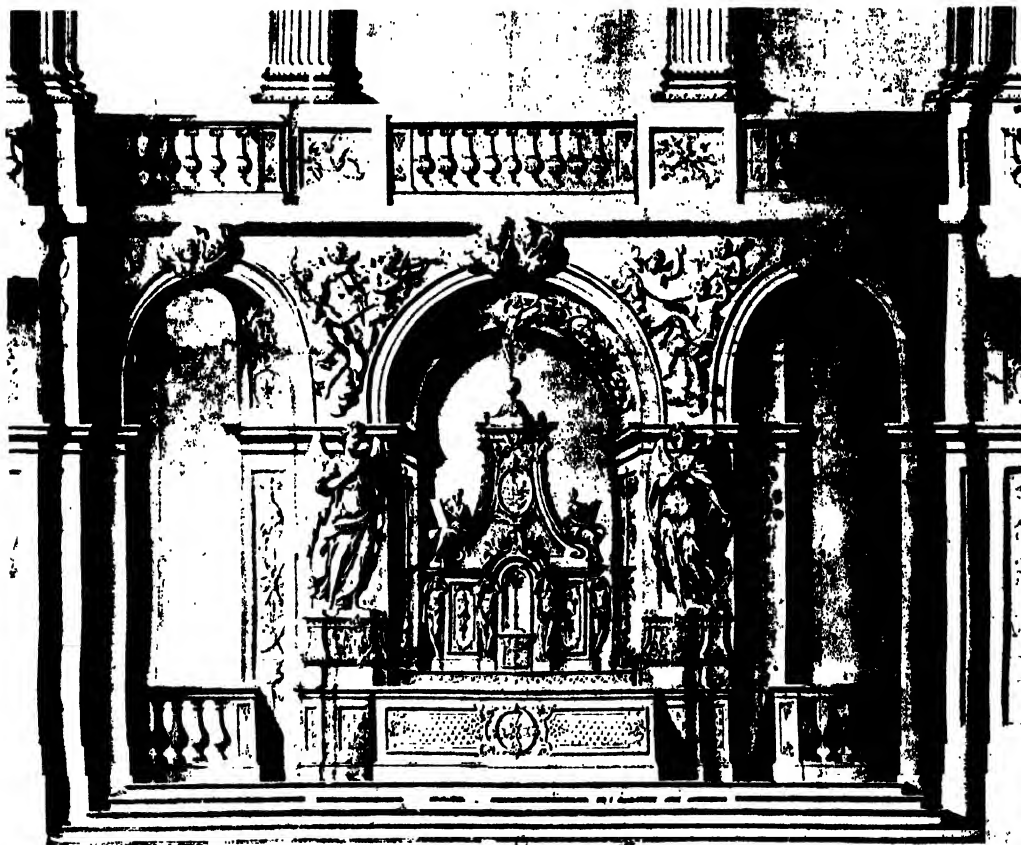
Design for the Apse of the Chapel at Versailles, 1707. Drawn by Pierre Lepautre
